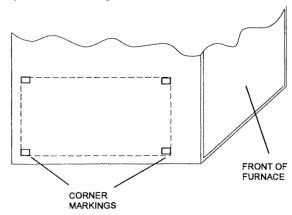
SIDE RETURN CUTOUT MARKINGS
